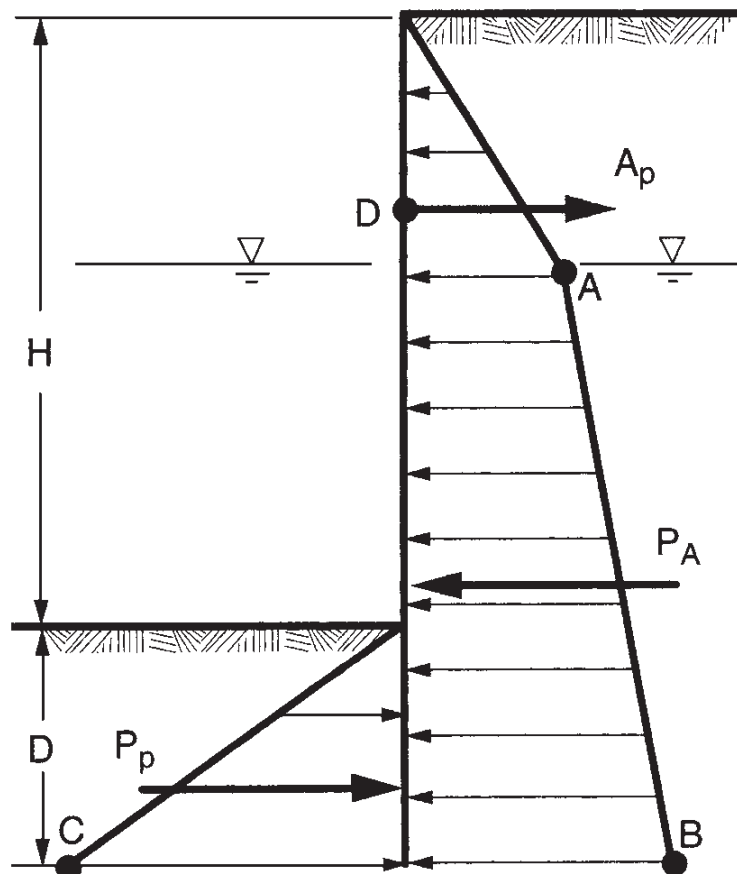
Earth pressure diagram for static design of sheet pile wall. (From NAVFAC DM-7.2, 1982.)
